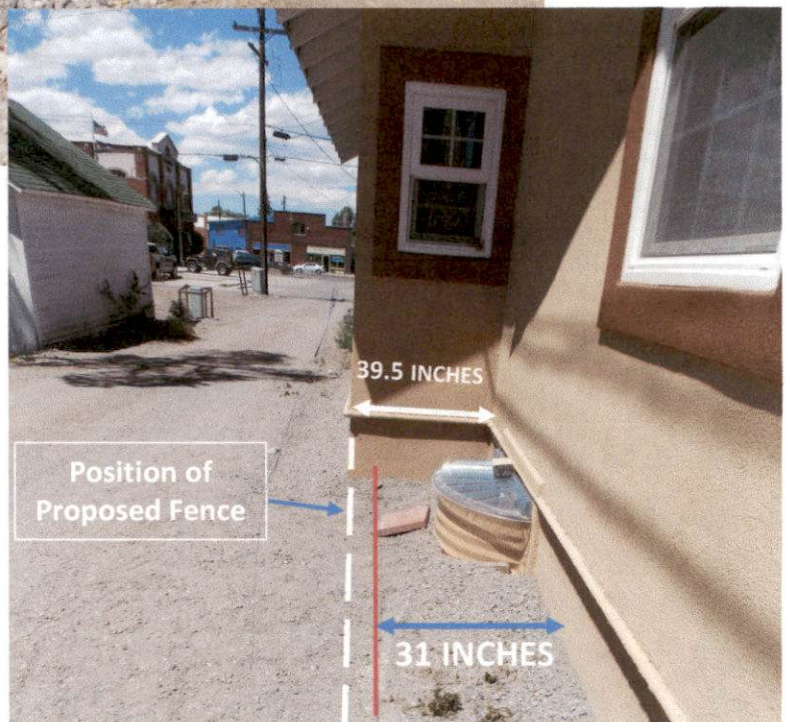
Request for permission to build a fence along the west side of my house at 750 6<sup>th</sup> ST. From the corner of the bedroom to front of house. The Follow-up and Revised Survey by Ed Eavenson, 7/9/20. shows the .7 ft (8.4 inch) bump out of the bedroom into the alley.
